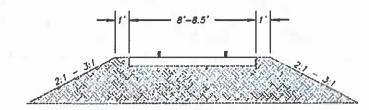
Typical Rall Bed Cross Section from MP 18.5 to MP 61
